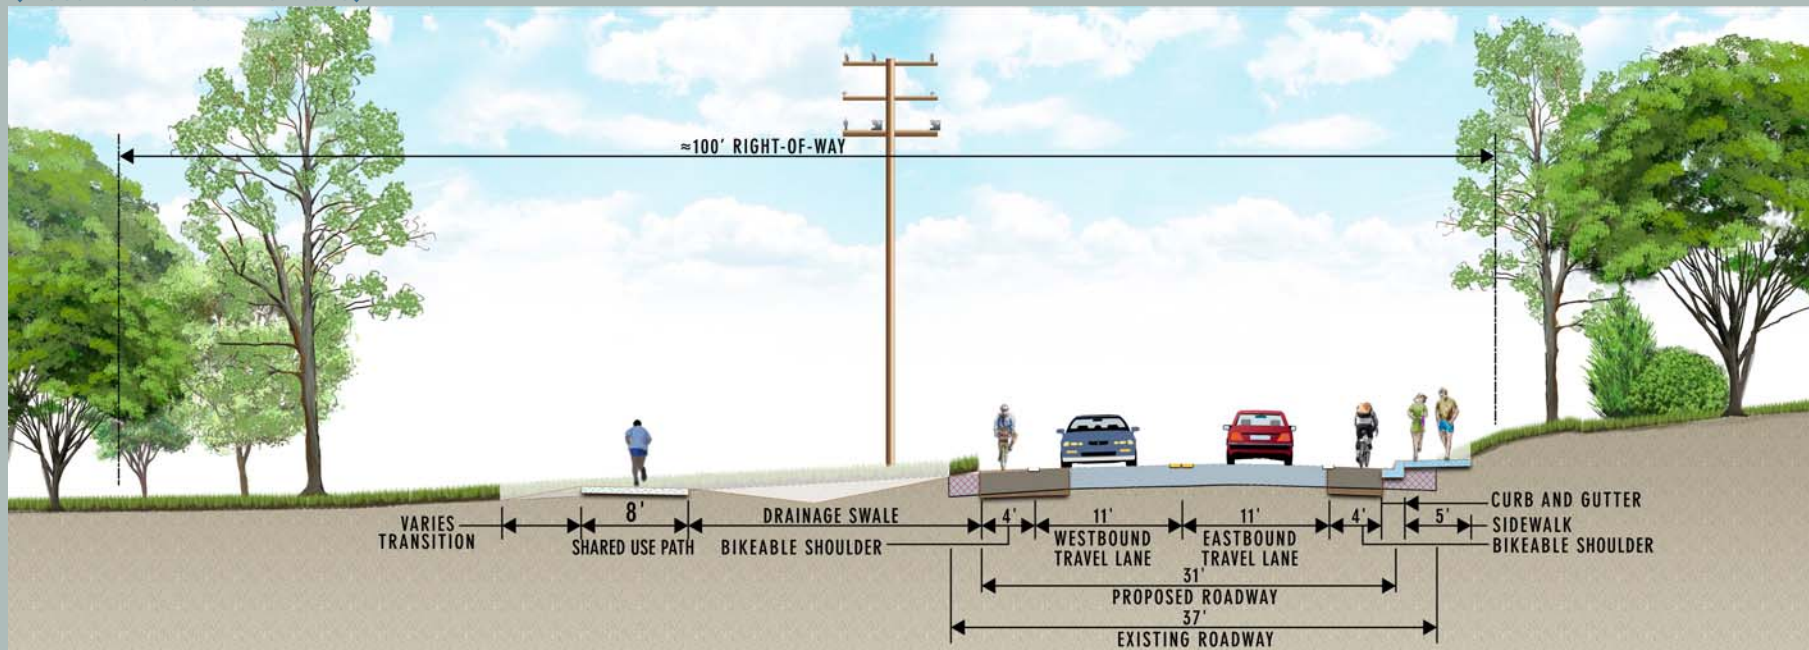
Alternate 4A - 8' Shared Use Path North Side and Sidewalk South Side with Bikeable Shoulders Typical Section Looking East (Recommended Alternate)
